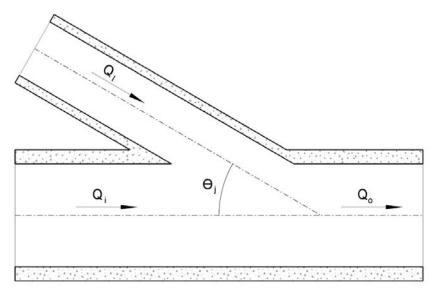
Interior angle for pipe junction without manhole (Source FHWA HEC 22)
